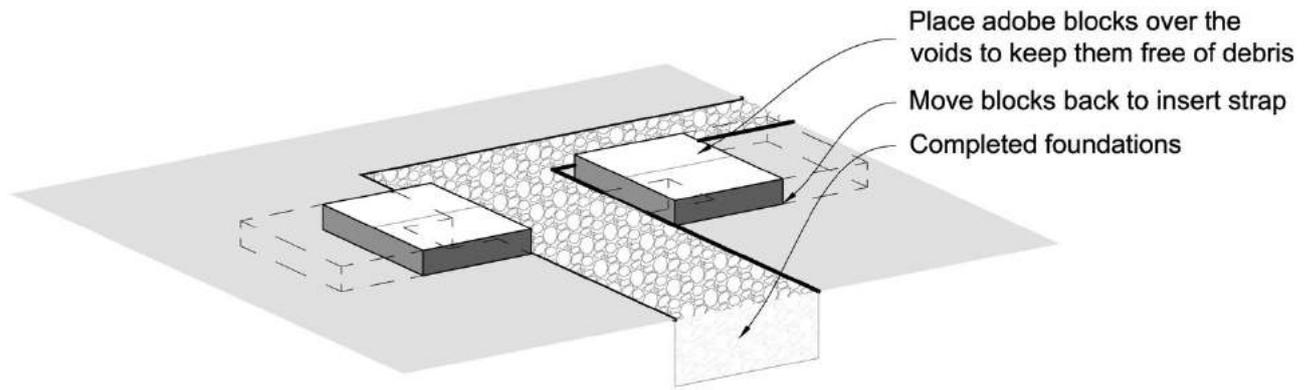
Adobe blocks protect the small excavations from filling up with debris and are slid back immediately prior to installing the strap under the wall.
